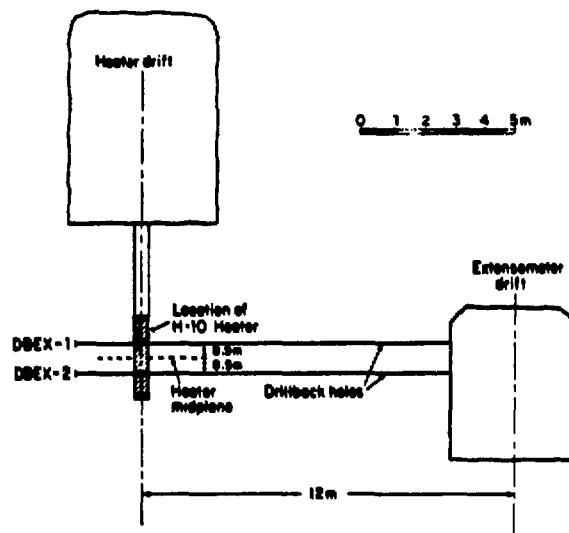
Cross section through Stripa heater hole and adjacent drifts, showing location of drillback holes.
